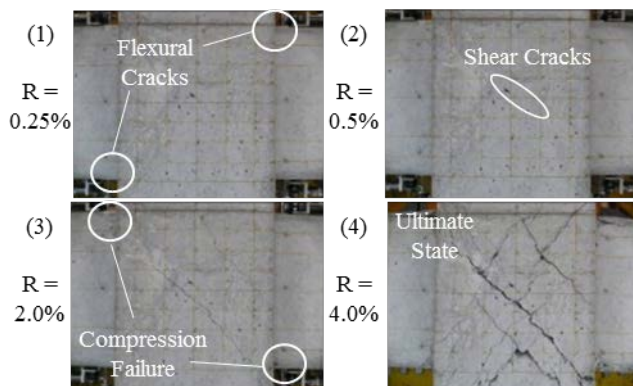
Failure Process of RC Beam-Column Joints
